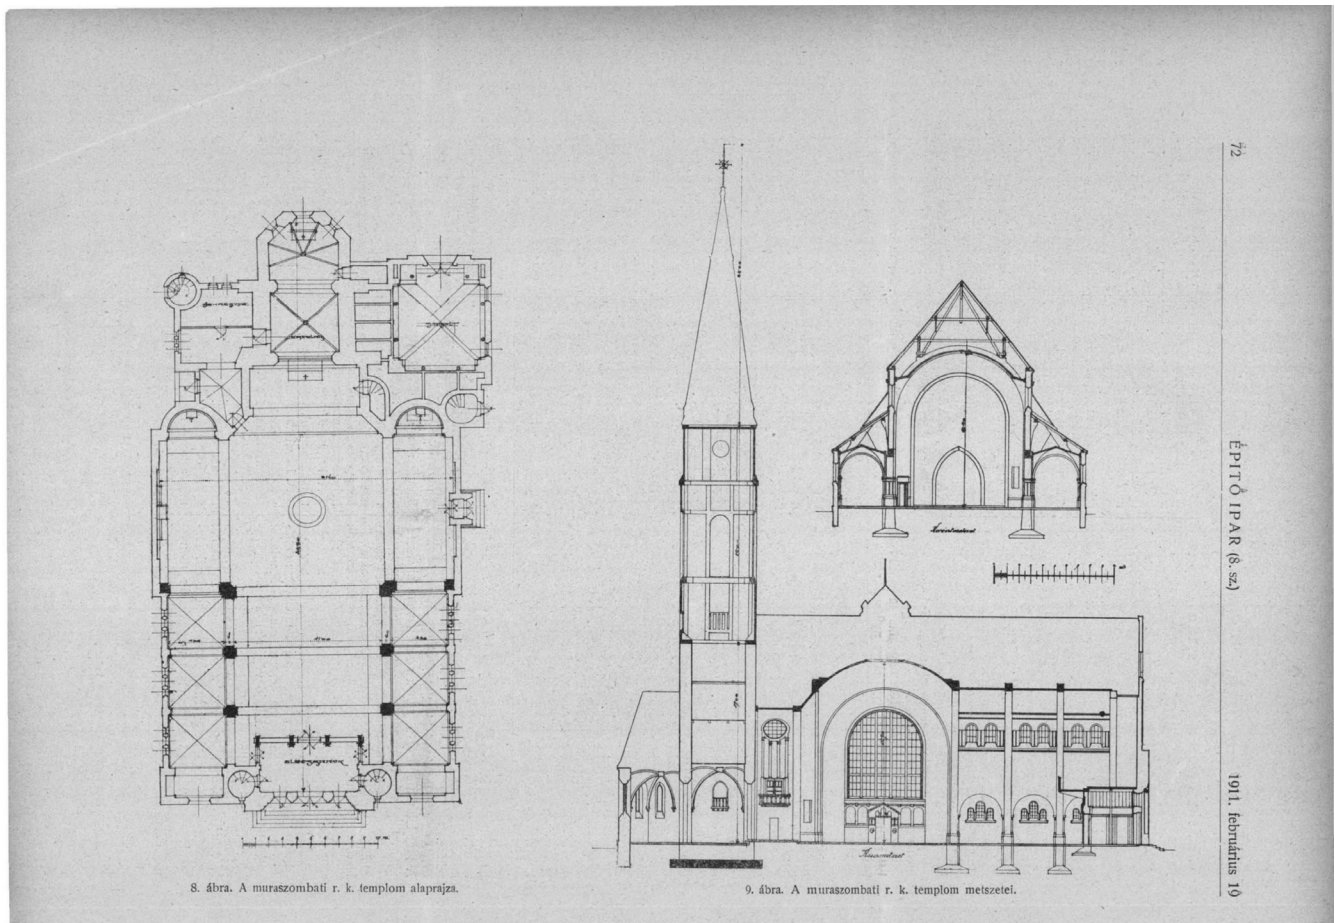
Layout and sections of the reinforced concrete basilica-type church in Murska Sobota²¹ [p. 72].
